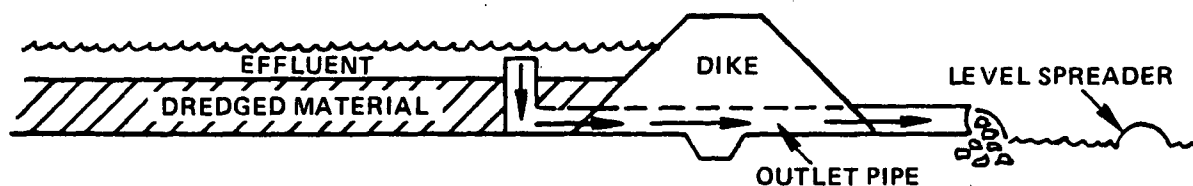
Outlet Pipe For Draining Clear Effluent From Containment
